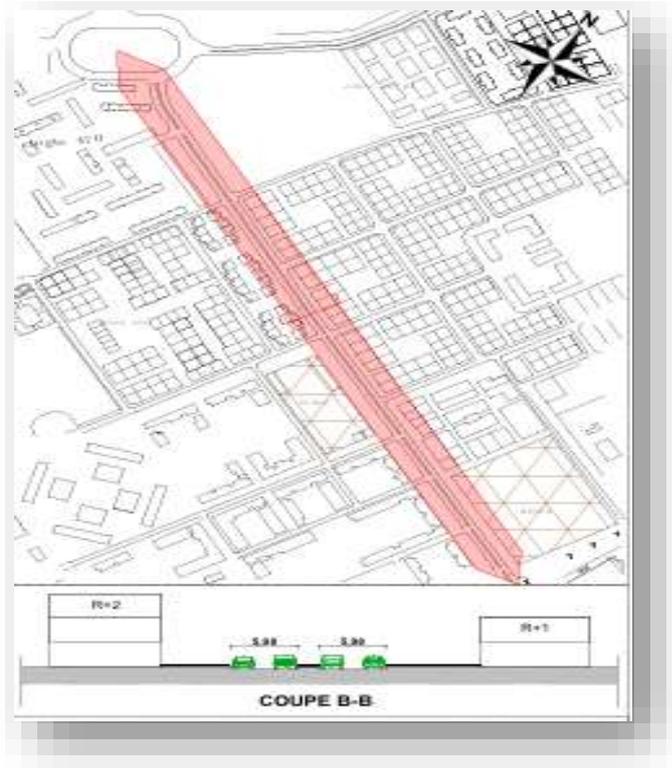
Tomi El Tayeb Street – Site Plan + Street Sections
